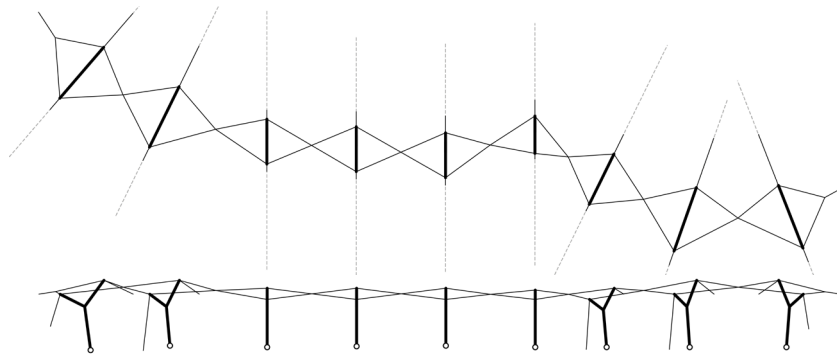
Plan and elevation of the pre-tensioned cable structure.
